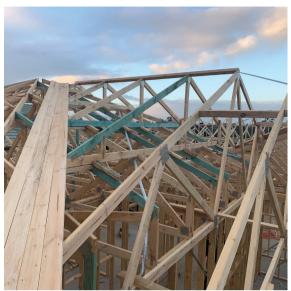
A supporting double truncated girder truss fixed over double studs
